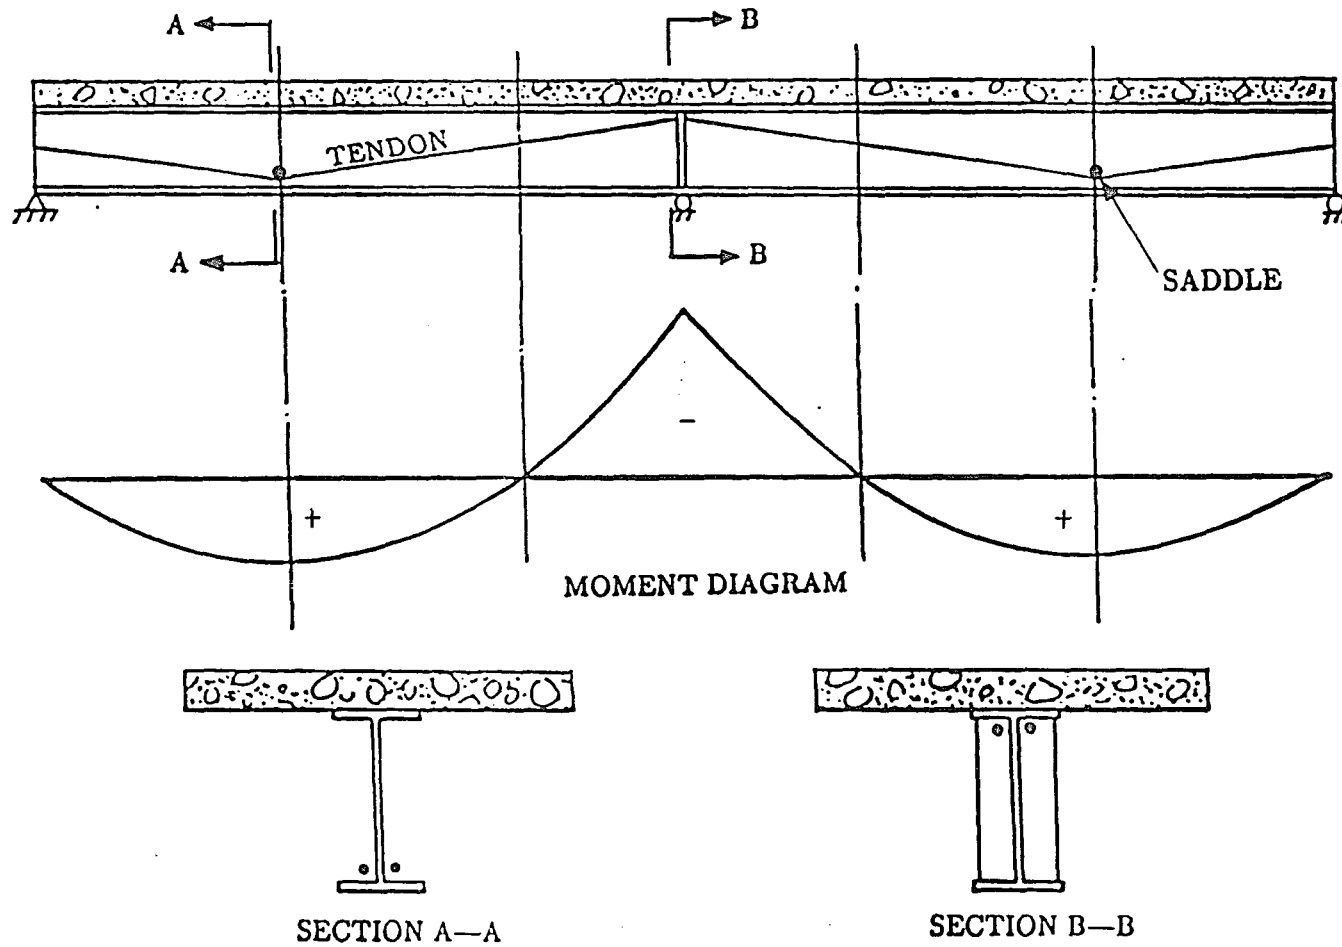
Two Span Continuous Girder with Draped Tendon
